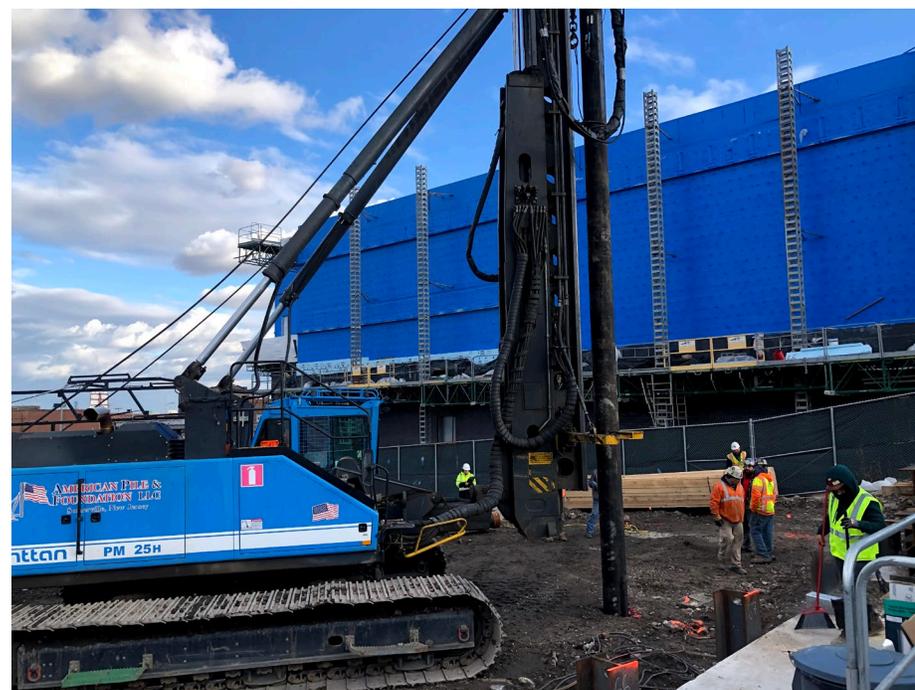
Looking east, American Pile and Foundation LLC driving pile in WCF-C1.
